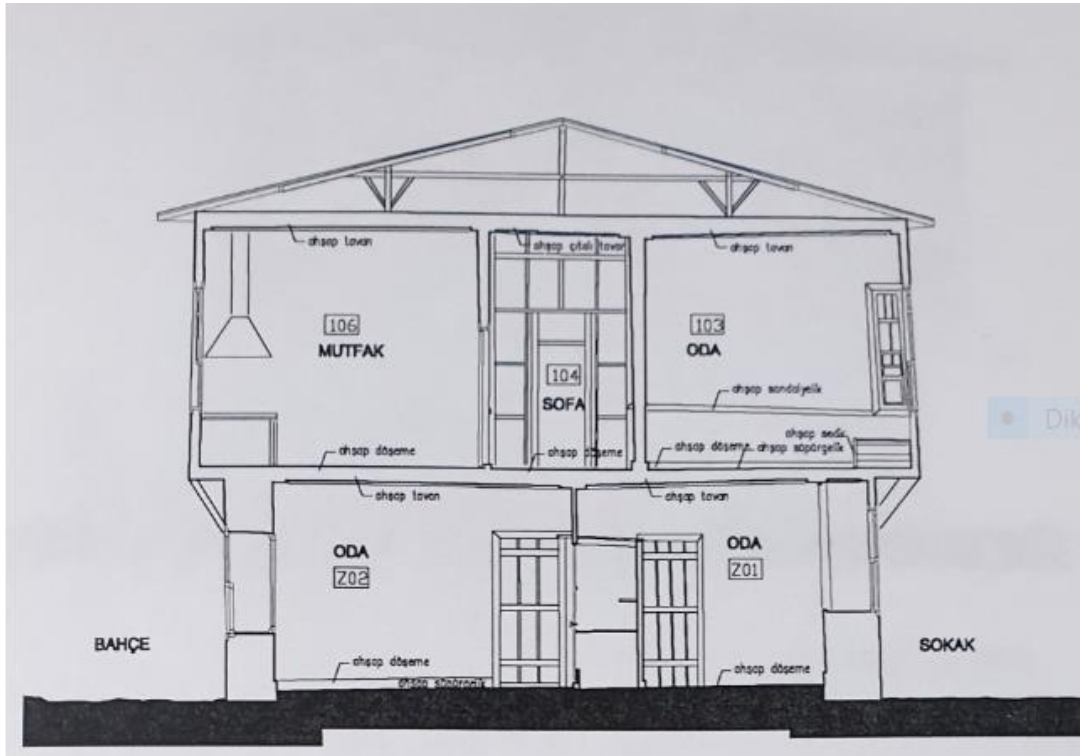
Section of the house at Dutlu street no:21 (Önen 2000).
